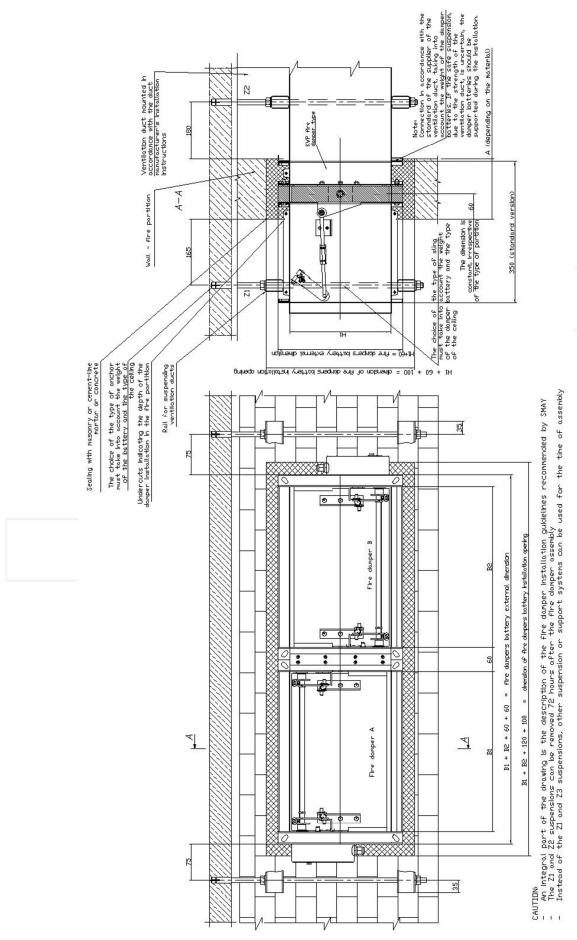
Installation of battery consisting of two fire dampers KWP-O-Ex in horizontal arrangement in wall
